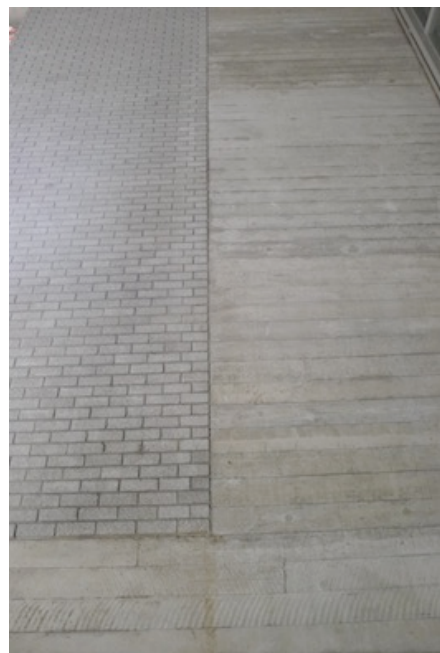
The junction of the brick wall and the board-marked concrete outside the Cottesloe Theatre - detail
